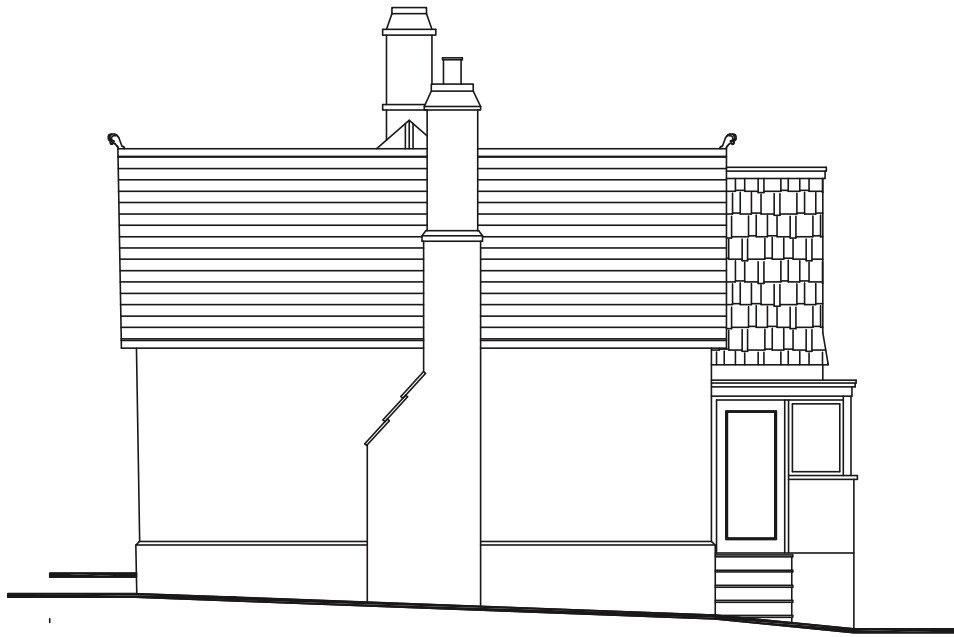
Cable Cottage, Salcombe; north east exterior elevation.
